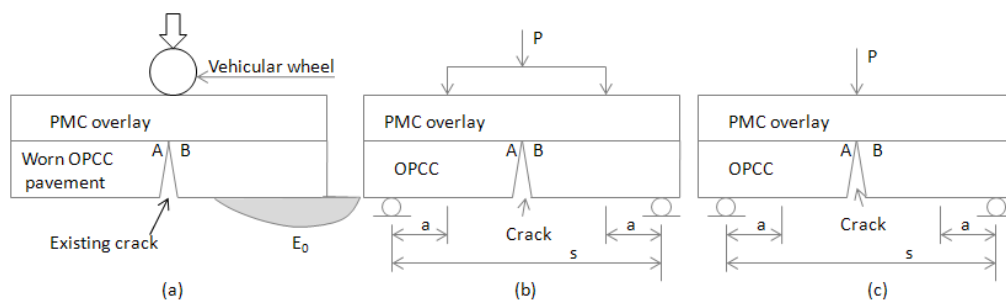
(a) overlaid pavement with an interfacial defect subjected to vehicular load, (b) composite beam with a crack impinging interface under 4PB, (c) composite beam with a crack impinging interface under 3PB
